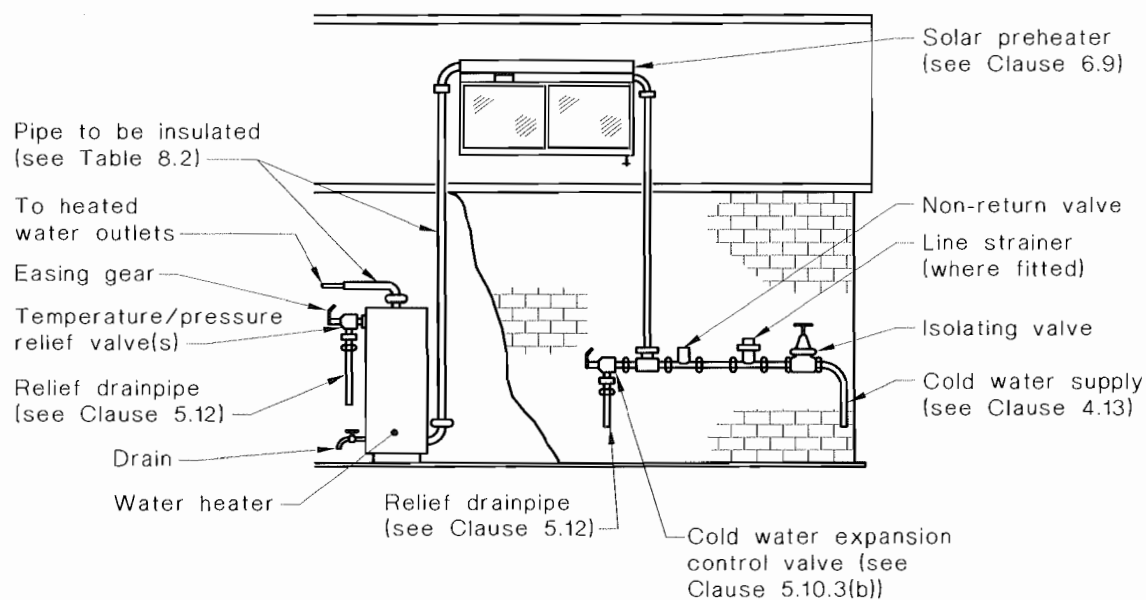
INSTALLATION OF UNVENTED (VALVE VENTED) WATER HEATER WITH SOLAR PREHEATER
